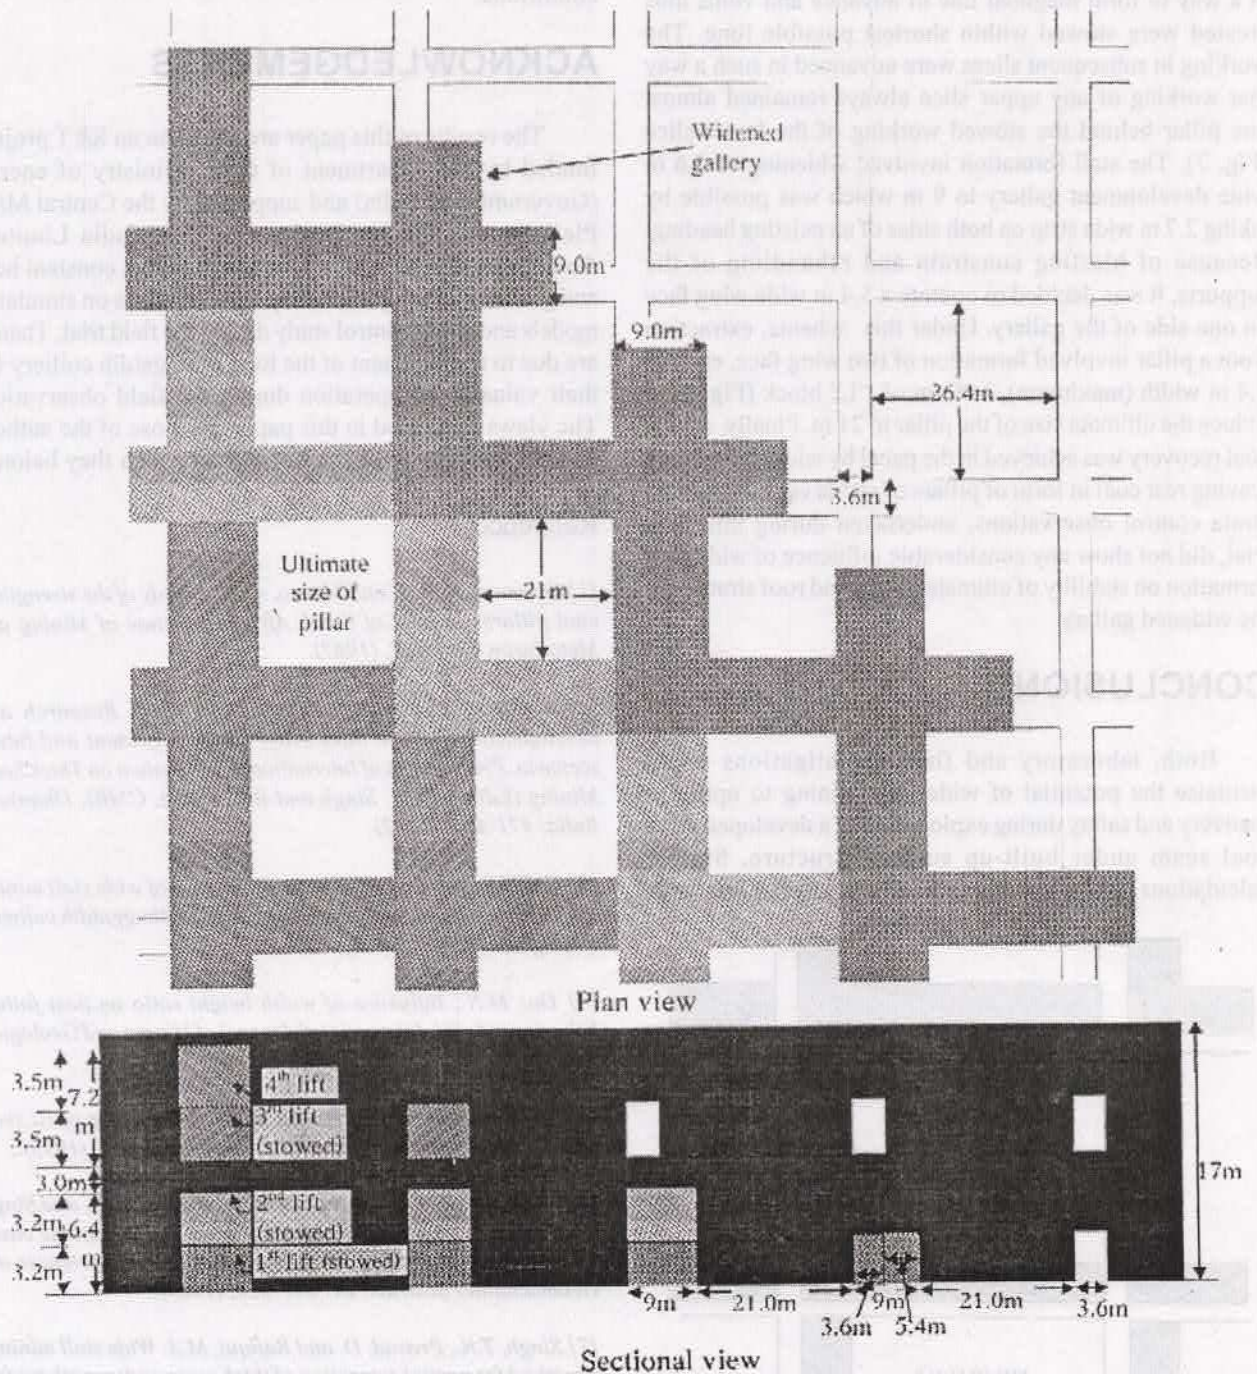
Plan and section showing sequence of extraction of the thick VII/VIII coal seam by wide stall method.
